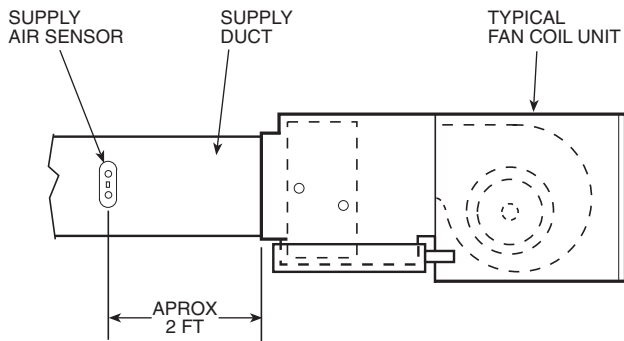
Supply Air Temperature Sensor Mounting Location
